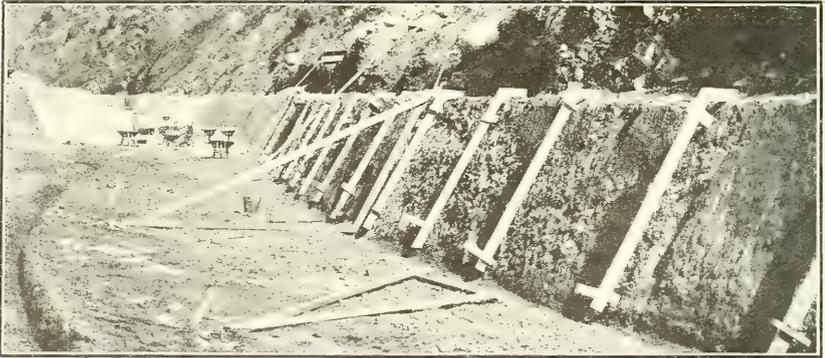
METHODS USED IN CONSTRUCTION OF CONCRETE LINING, DAVIS AND WEBER COUNTIES CANAL, OGDEN, UTAH.
